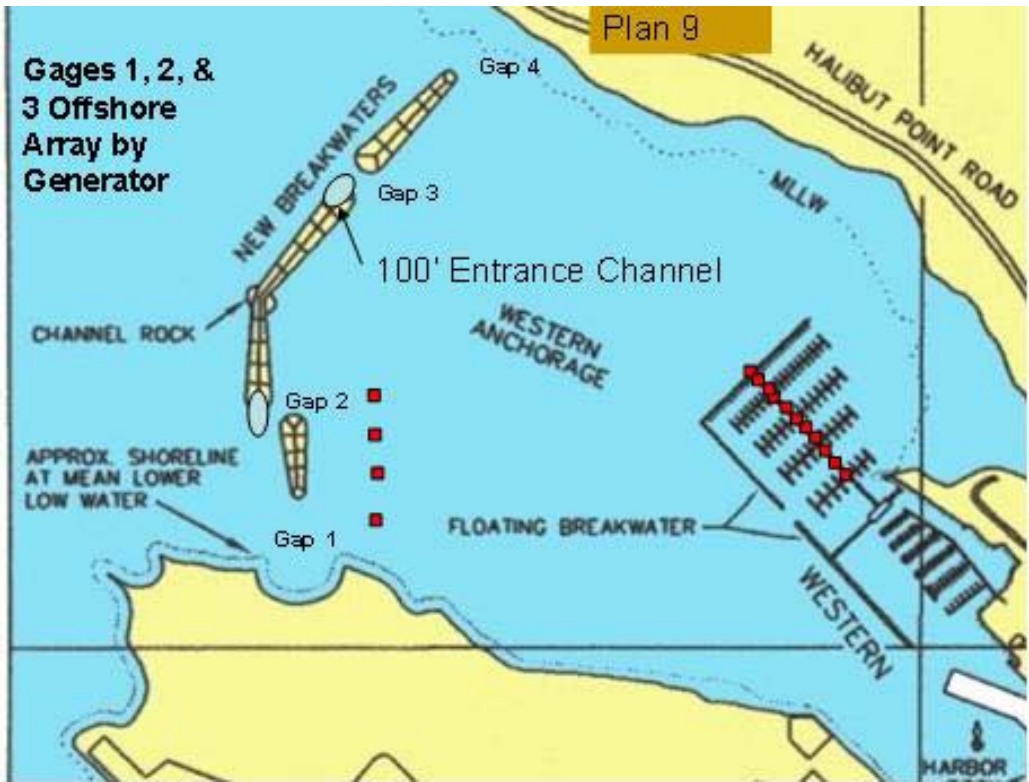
Plan 9 is a combination of Plan 3 and Plan 6.
